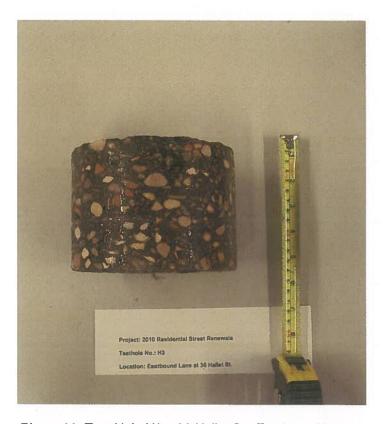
Test Hole H3: 36 Hallet St., Eastbound Lane, 55 m E of W sidewalk at Rover Ave., 1.9m N of S curb
